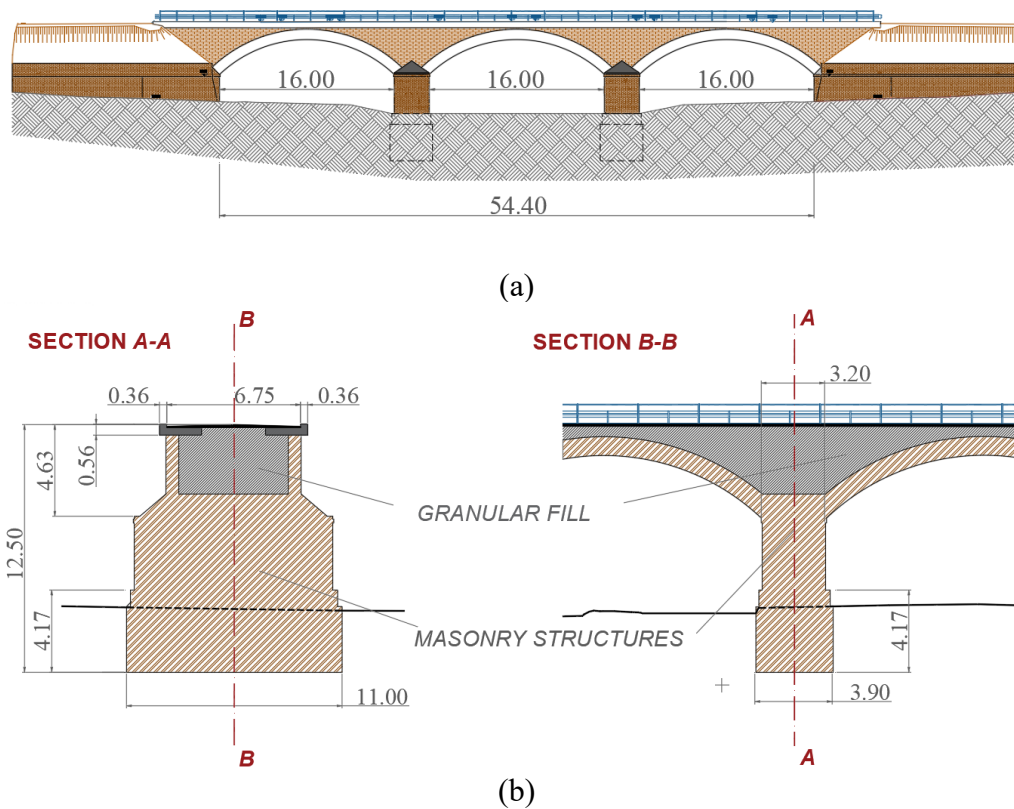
Scheme of the case study: (a) bridge longitudinal view, (b) transversal and longitudinal sections.
